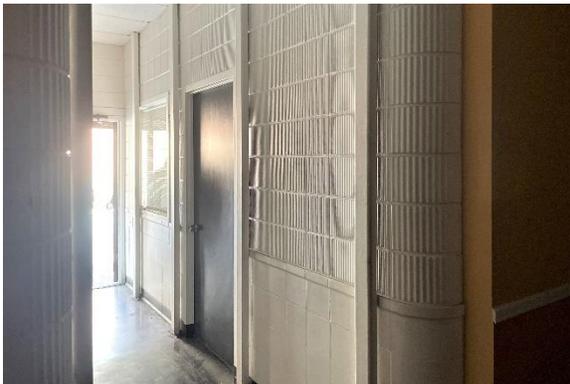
Painted glass block wall at entry of Building 1, view northwest.
